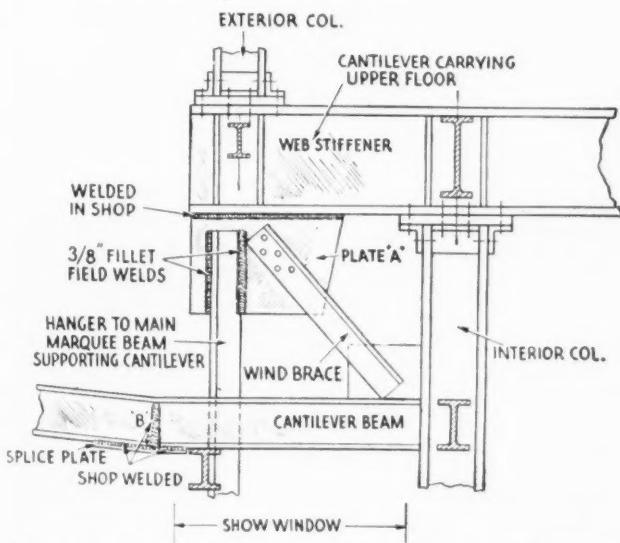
Section view of cantilever construction over show windows which supports marquee and exterior columns for upper floors.
